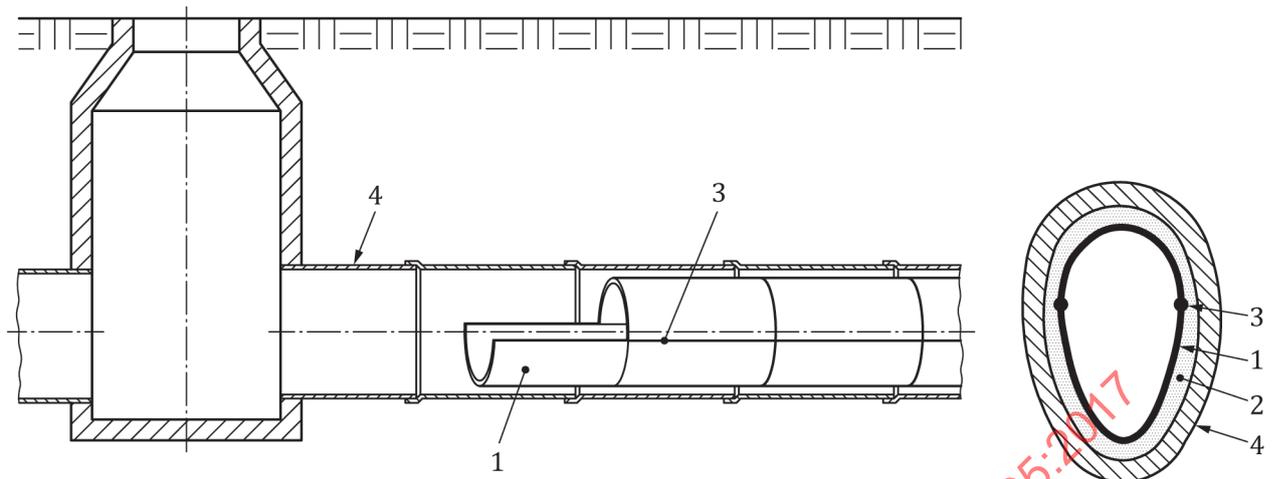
Lining with spirally-wound pipes — Schematic representation of winding of liner from pipe-traversing winding machine (Method B)
